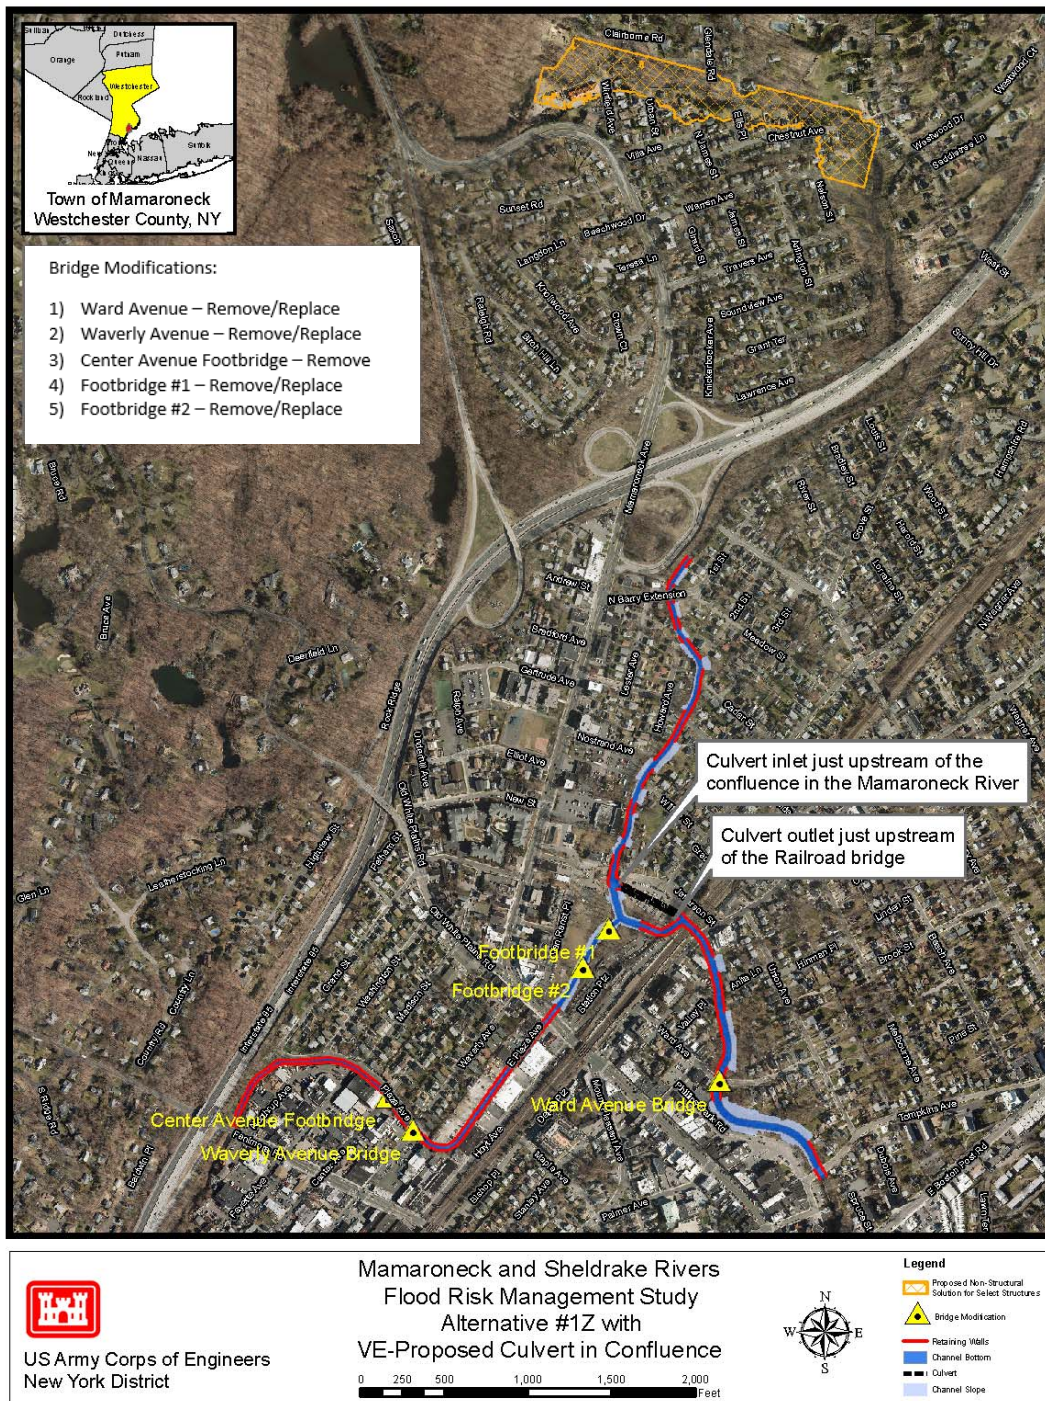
Alternative 1Z | Plan View of Alternative 1Z with the VE Proposed Culvert in Confluence (note: The diversion culvert makes the removal of the Station Avenue Bridge unnecessary.)
